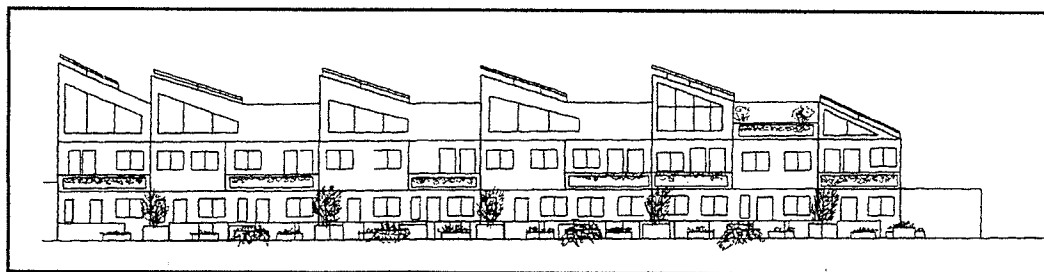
North-South, Section-Elevation E-E Roof Garden Residential Streetscape mounted solar panels.
